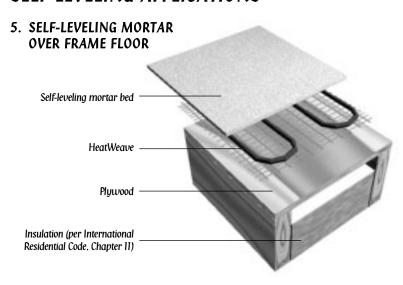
and #6 show the best method if you are installing non-masonry floor coverings.
